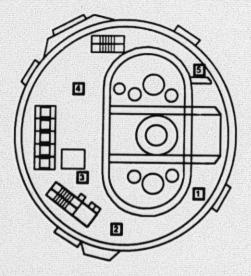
Radiation Survey Locations in the Reactor Building Elevation 305 Feet
